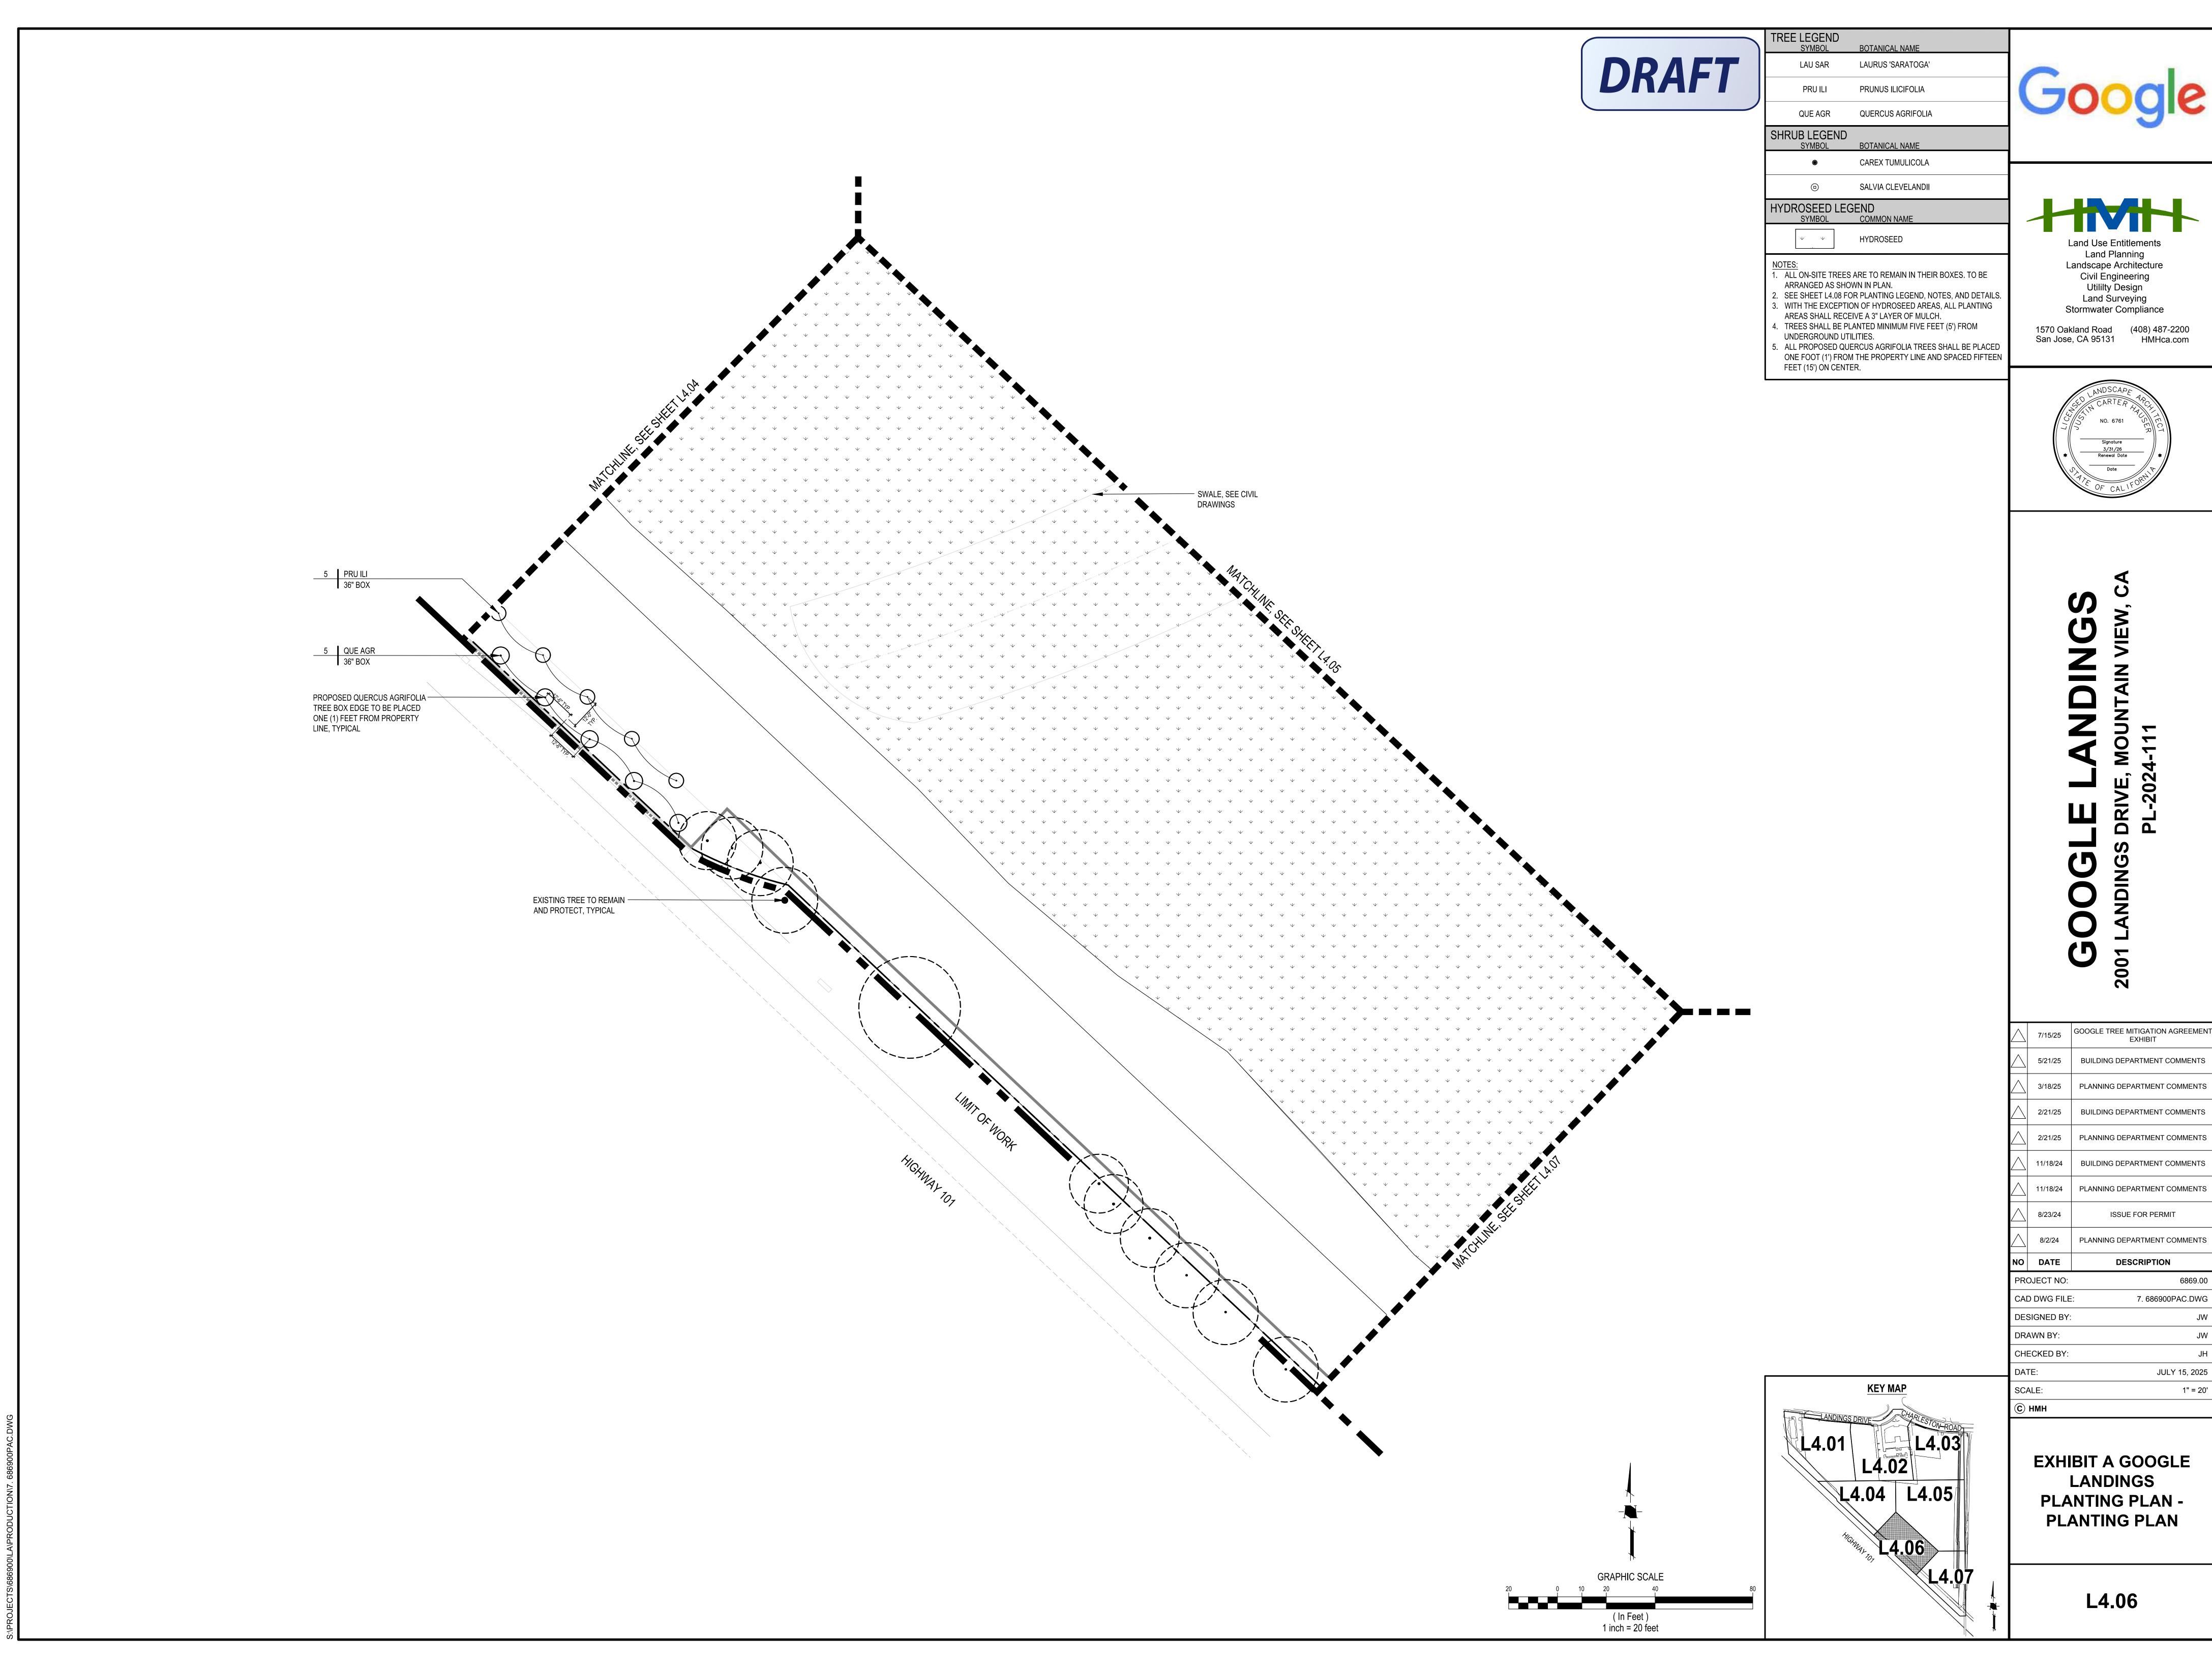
EXHIBIT A GOOGLE LANDINGS PLANTING PLAN -PLANTING PLAN
